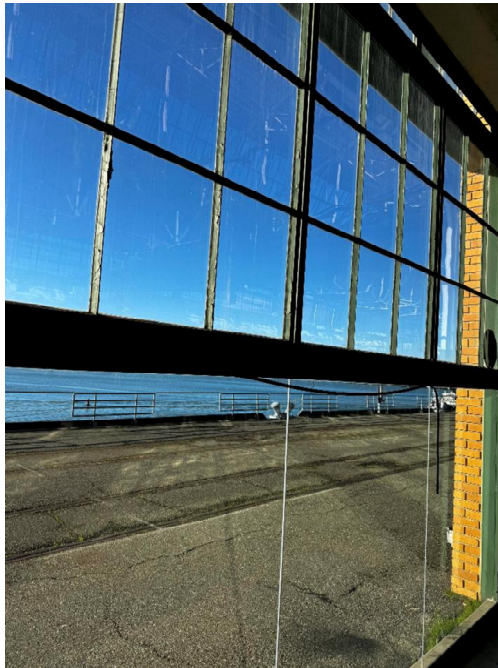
Painted interior wall, Structural frame (1/8/2026)
